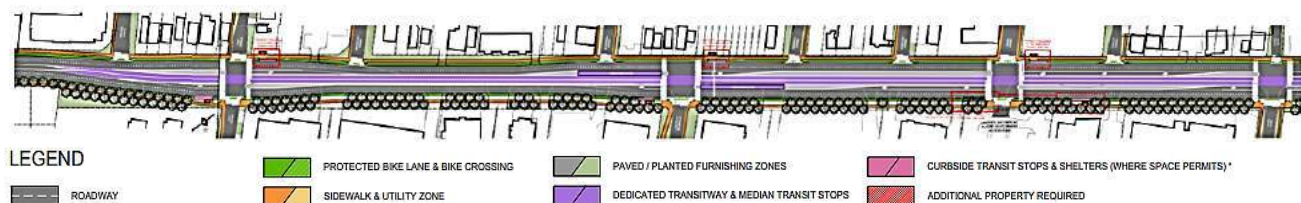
LAKESHORE ROAD EAST – ROLL PLAN EXCERPT (LAKESHORE CONNECTING COMMUNITIES TRANSPORTATION MASTER PLAN: CITY OF MISSISSAUGA / HDR)
